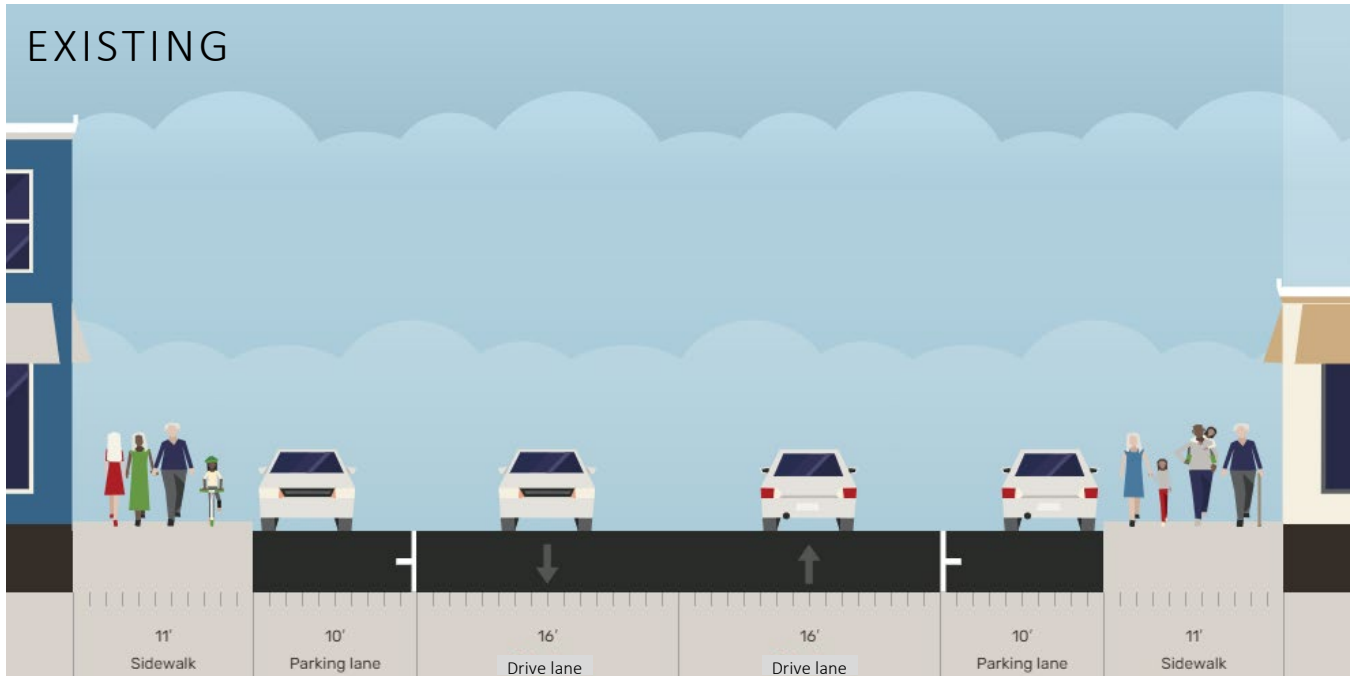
Michigan Avenue – Local Bike Connection Street Reconfiguration Section
